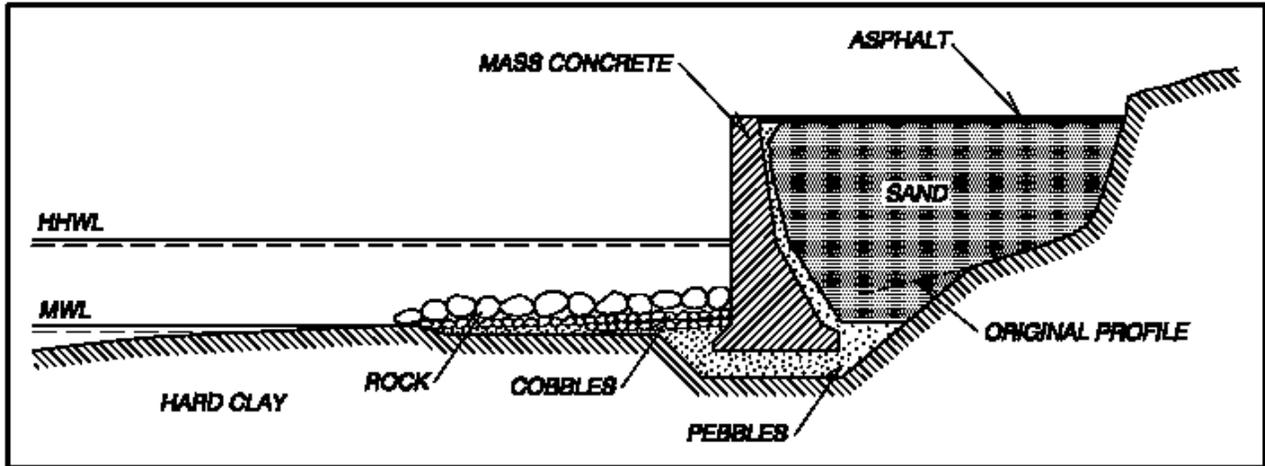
Typical concrete seawall (vertical structure) cross-section. (Burcharth and Hughes 2002)
